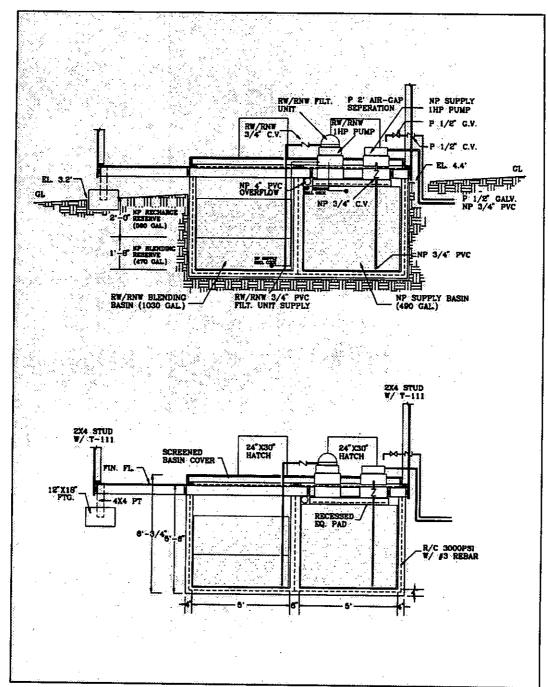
Greywater facility east elevation. Grosskopf, Kevin R. University of Florida, 1994.
